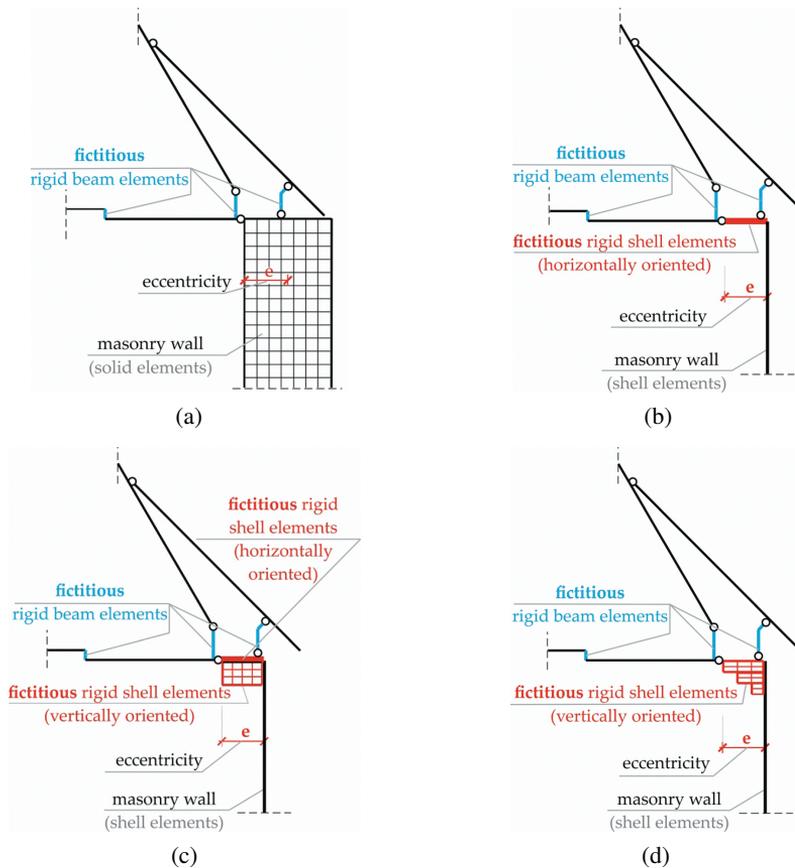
Static schemes of the connection of the nave's roof truss with the walls and the rigid fictitious elements used in the models: a) reference solid model No. 1, b) model No. 2, c) model No. 3, d) model No. 4
